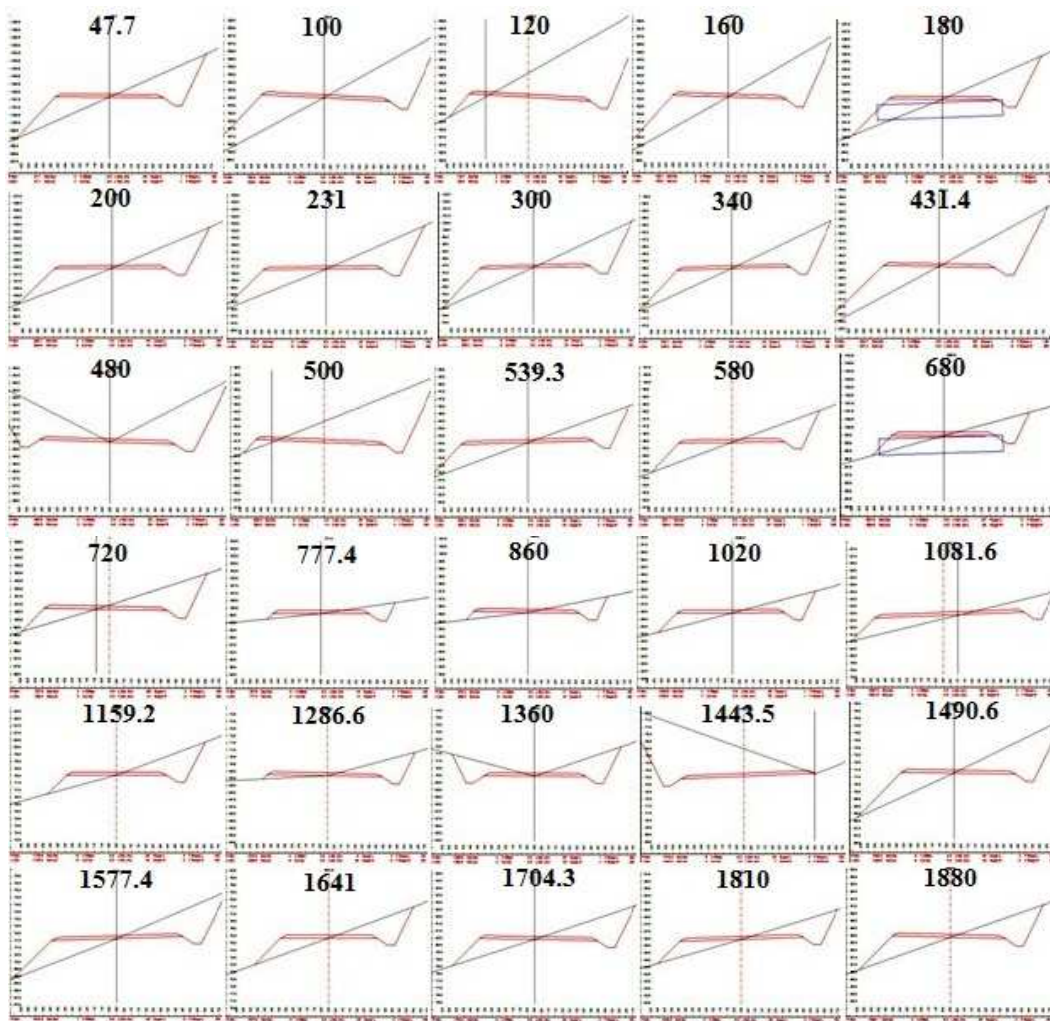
Geometric specification of cross-section in the location of pavement rutting
